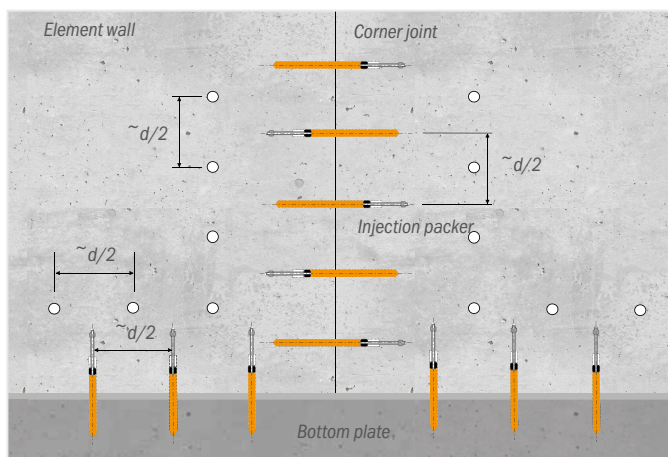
Drilling scheme for sealing an element wall ceiling by injection (example) [7]
